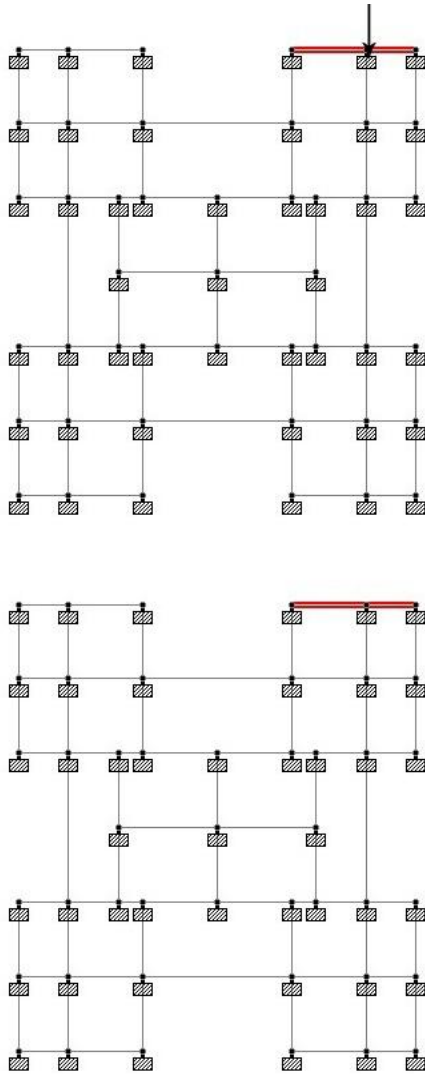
Stress generated in Shear wall in G+26 Building Structure
